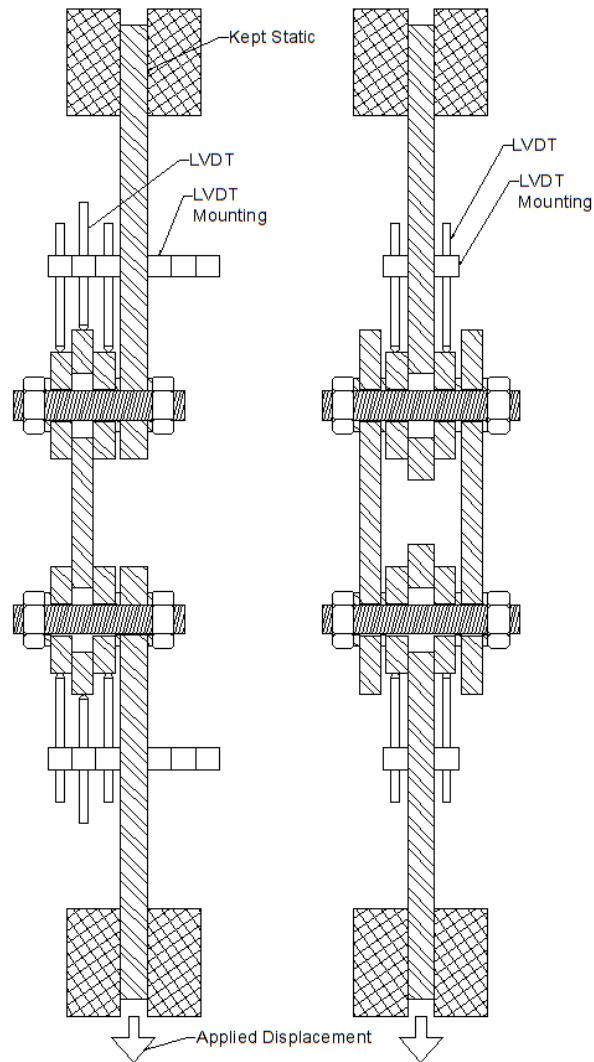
Alternative test specimens: Left) Non-symmetrical design; Right) Single central connection design
